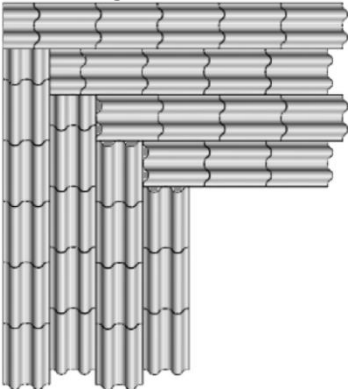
Offset of joints at the corner of a high-density concrete block wall. Always follow the instructions provided by the designer of the building or structure!
